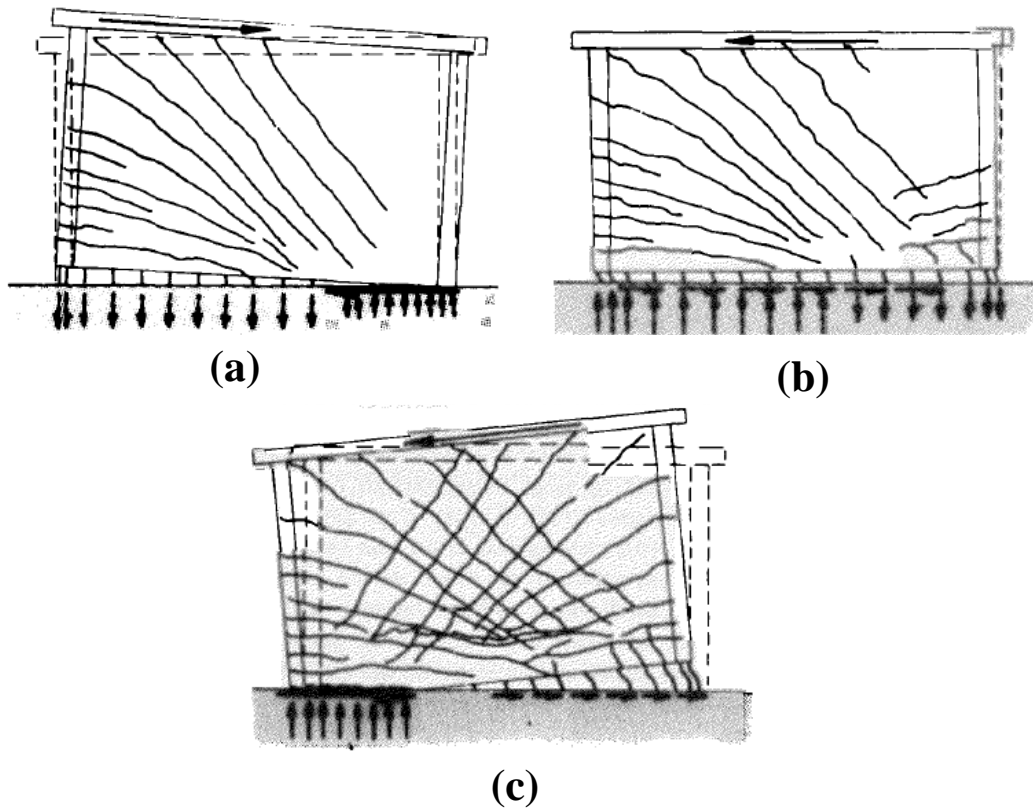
Mechanism of sliding shear failure (Paulay et al., 1982)
